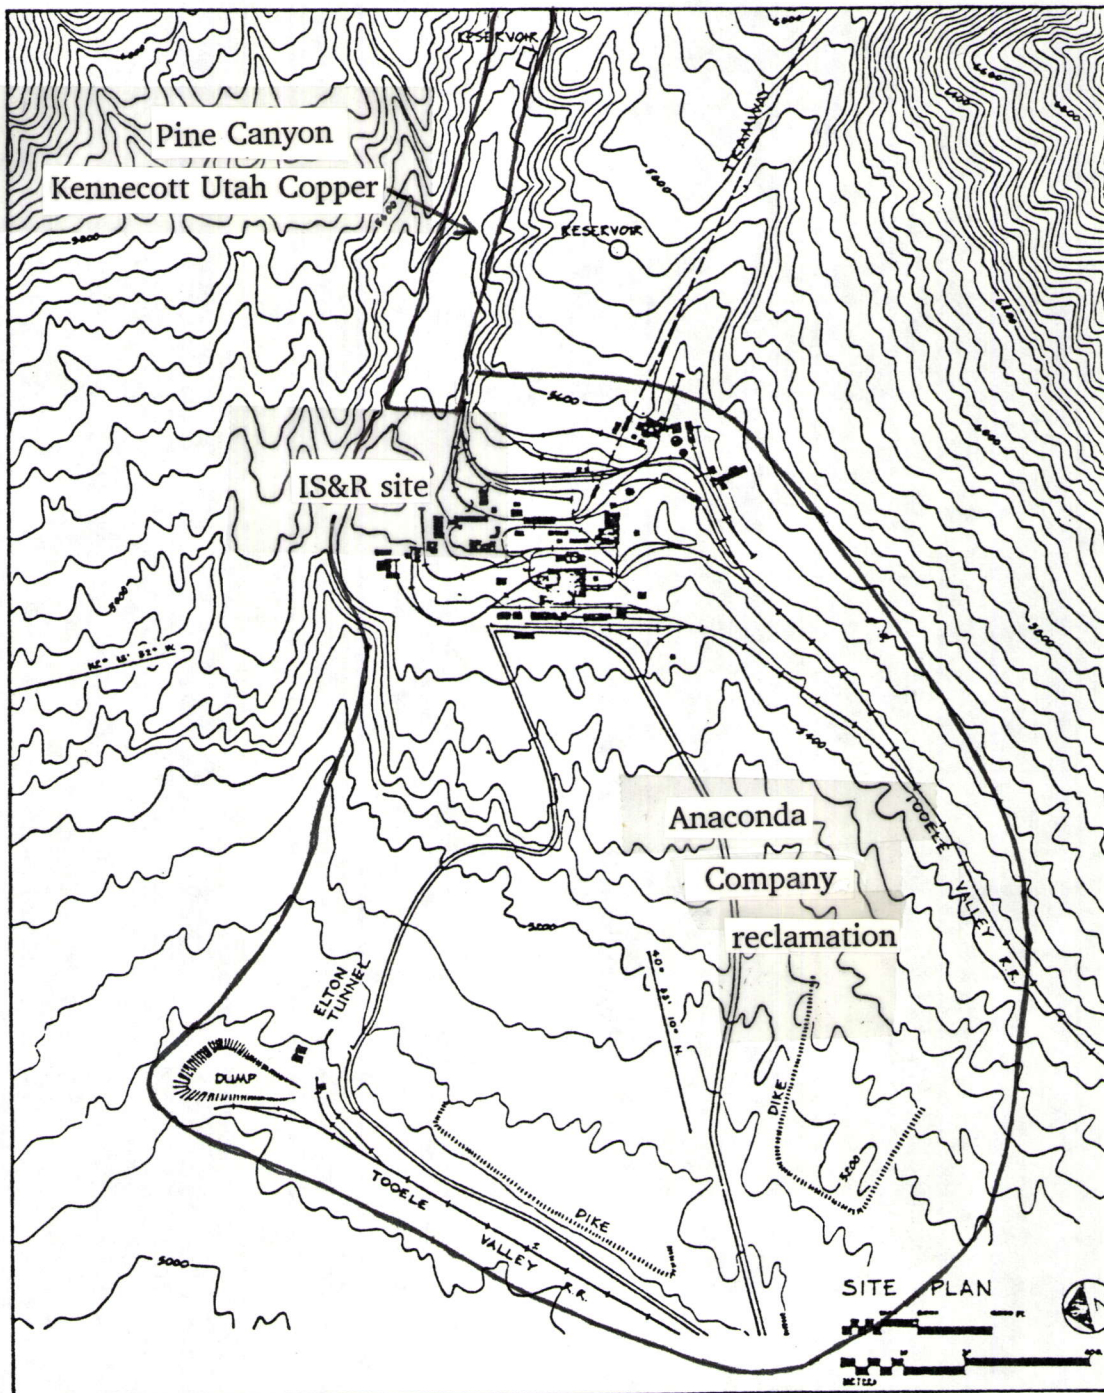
Site plan. (Drawing by the Utah Summer Survey Team, HAER.)
